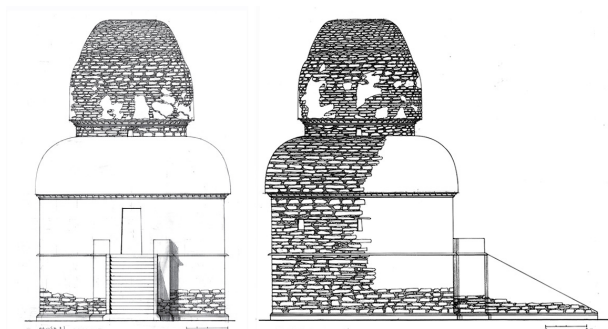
North and East elevations of Gumbat (after the end of the excavations; 2011).
